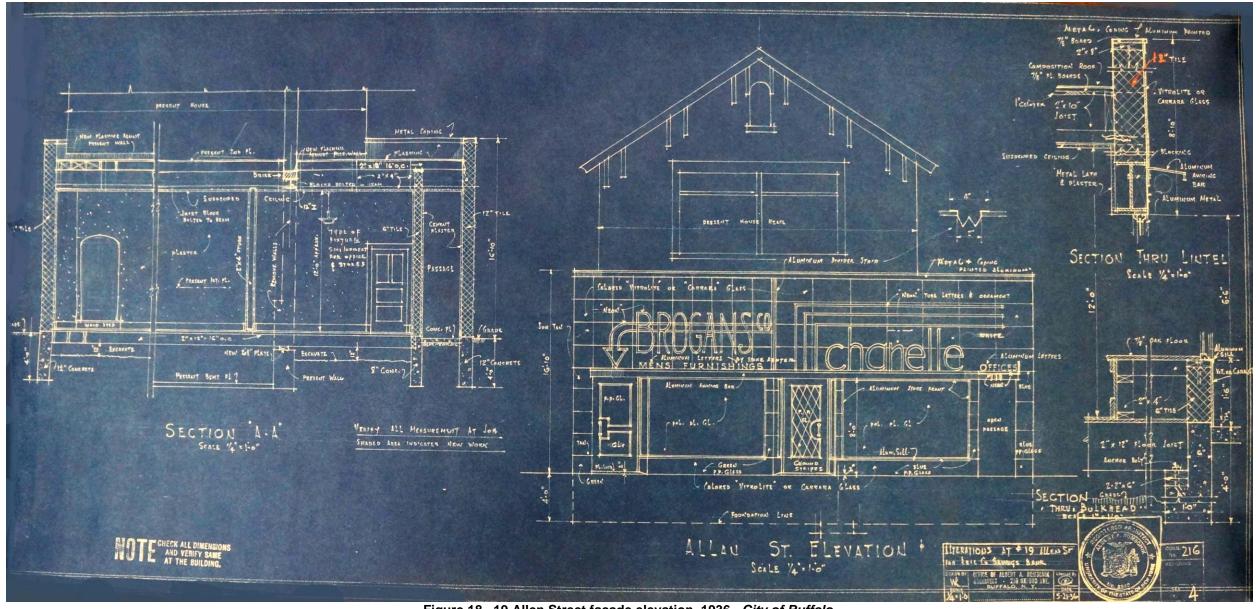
19 Allen Street facade elevation, 1936. City of Buffalo.
